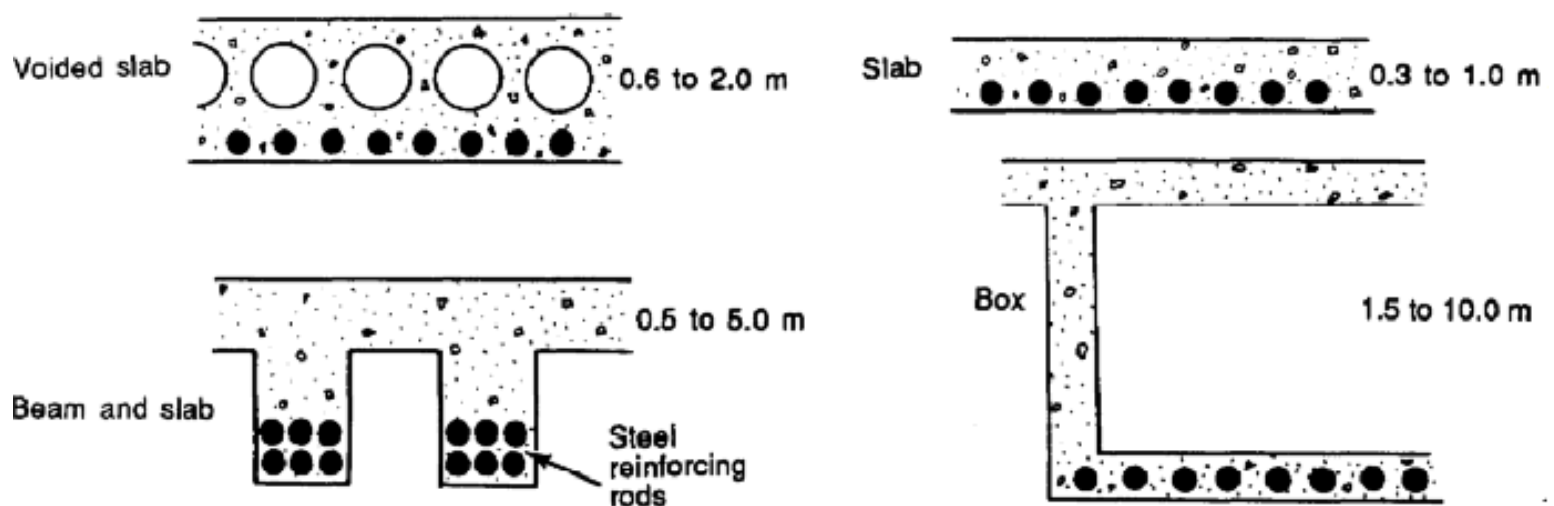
Midspan, cross-sectional views of typical concrete bridges
